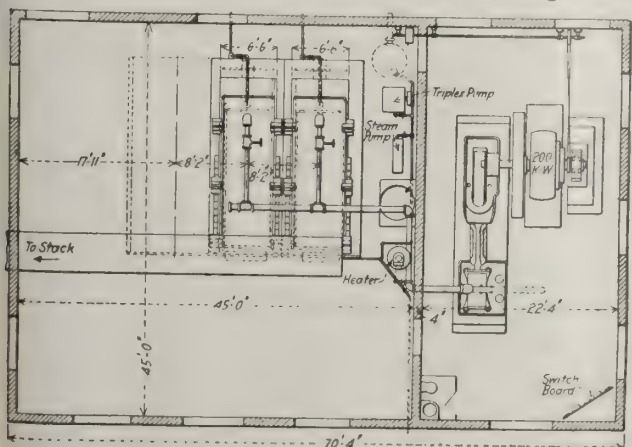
PLAN OF PLANT OF BRISTOL MFG. CO.
